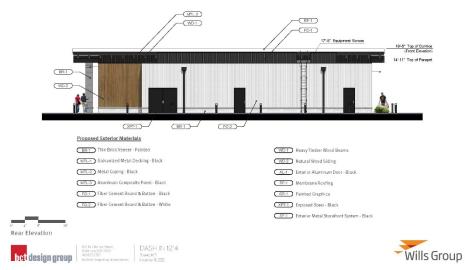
Rear Elevation (Facing West) of the Food or Beverage Store
